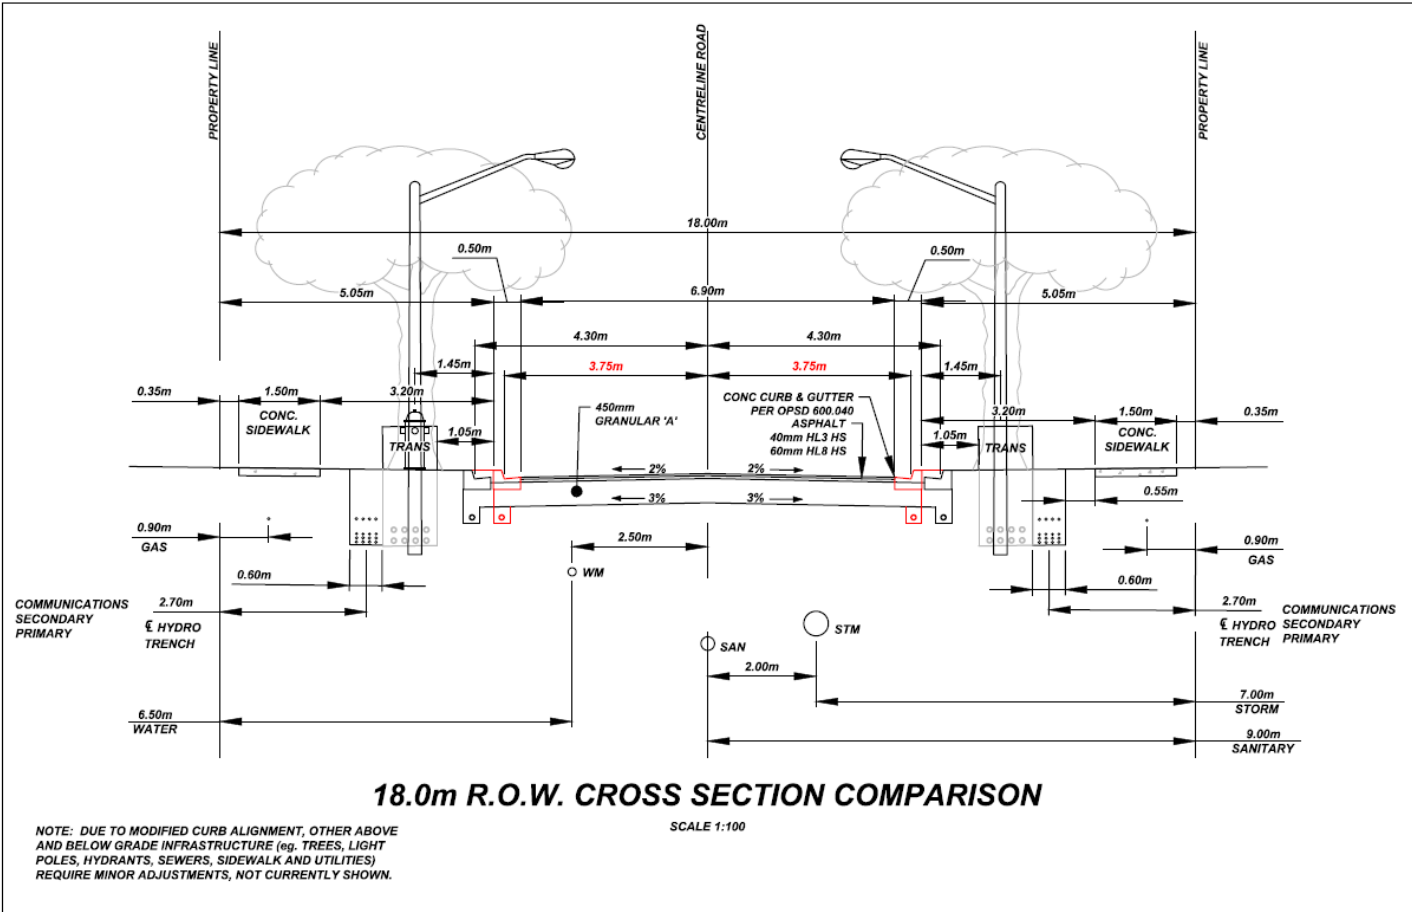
Street Layout with ROW and Proposed Pavement Detail
